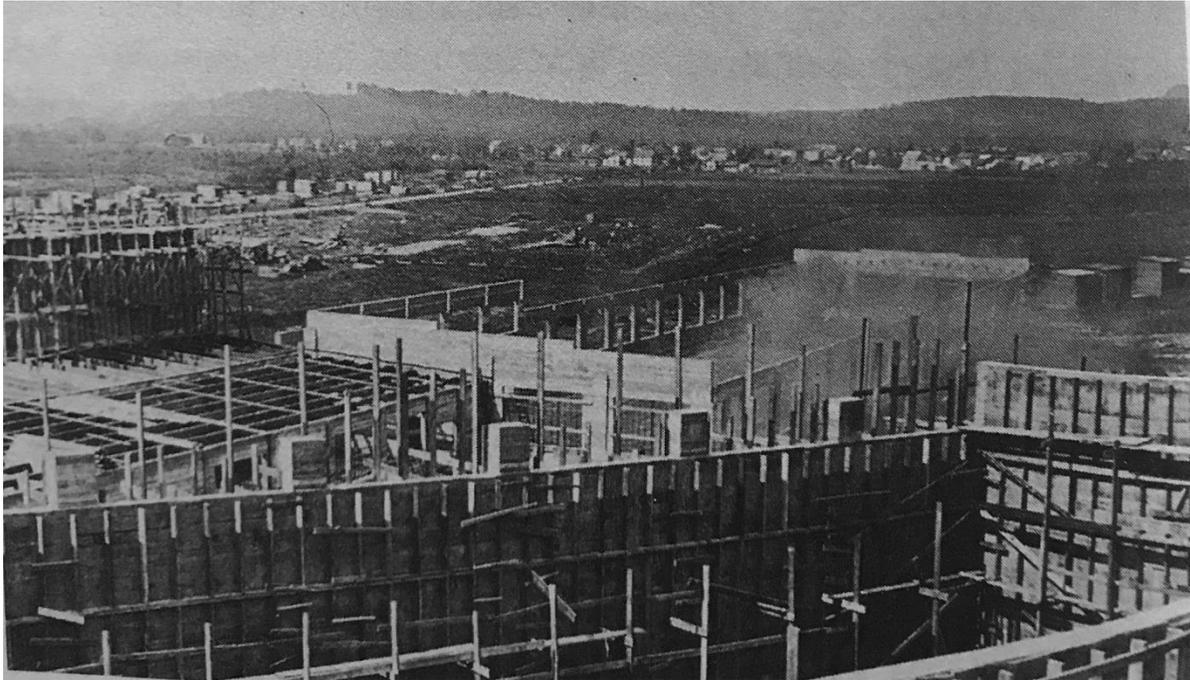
1917 construction photo showing Building 4 (foreground) and Building 1-Section A (background). (Photo from Mostly Spruce and Hemlock, p. 164.)
